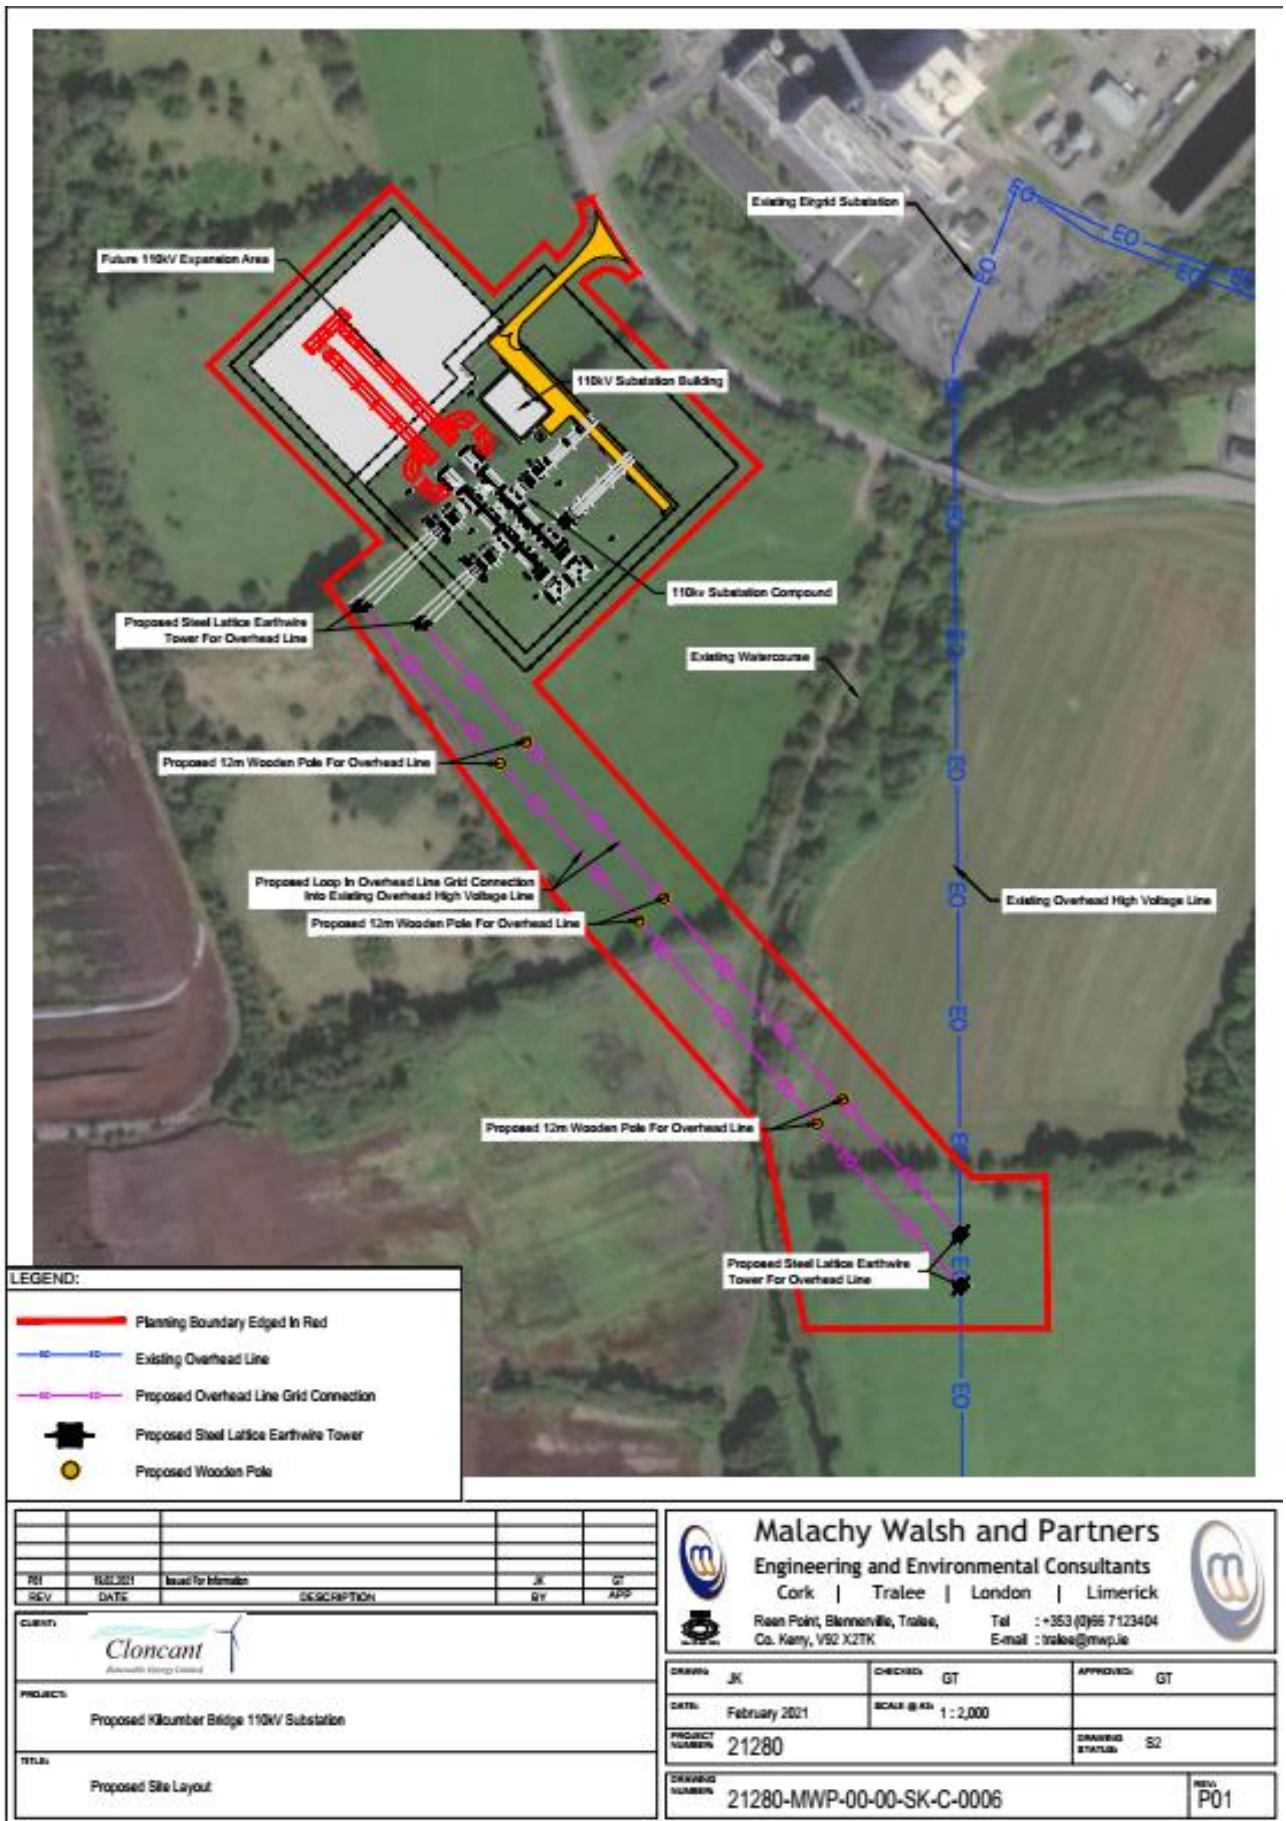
Proposed Site Layout (full size in Vol 3 Appendix 6 Drawings).
